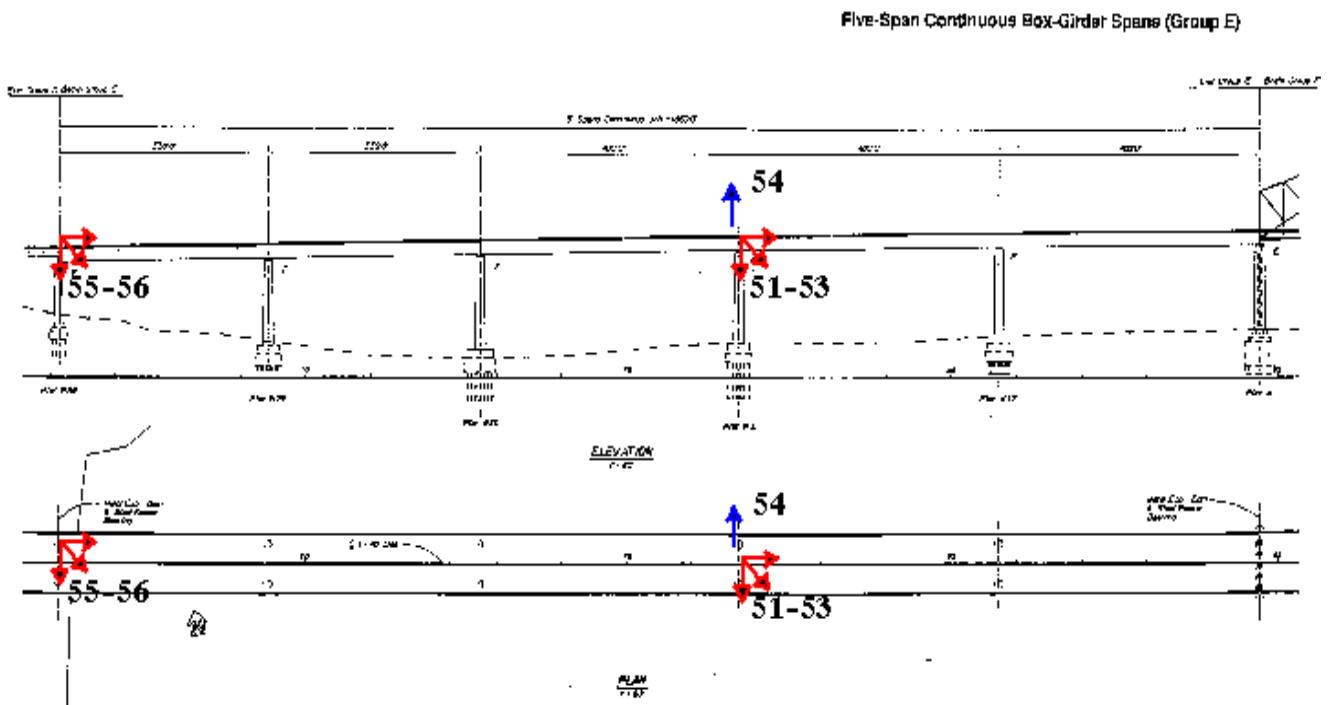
West Approach to the I-40 Bridge and Sensor Locations
